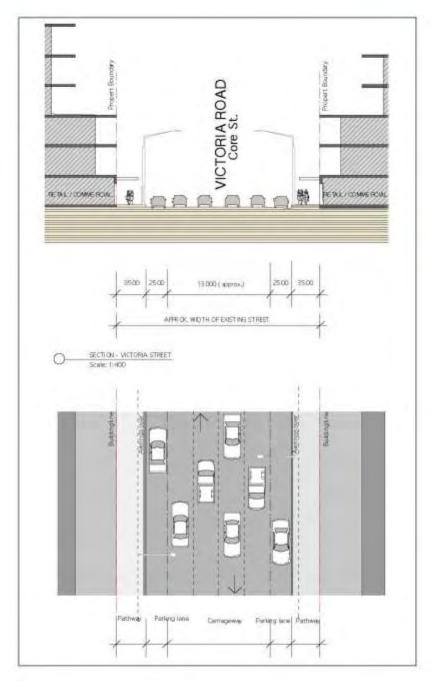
Victoria Road - Town Centre Precinct Section
